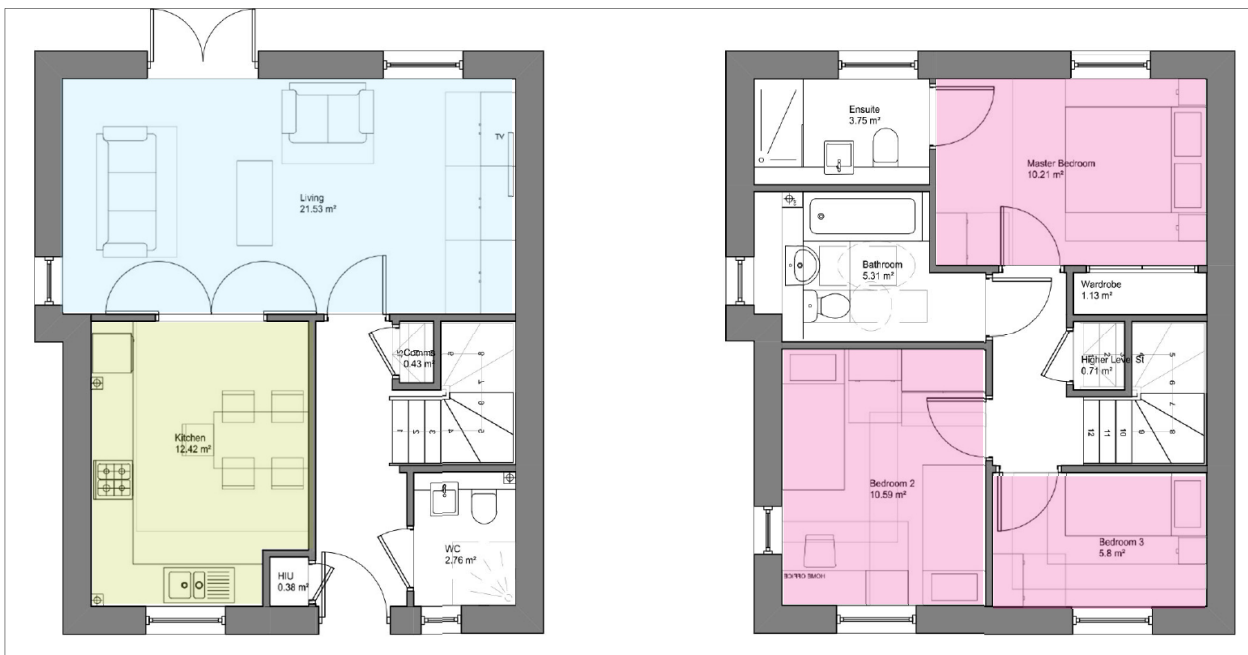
Dwelling 120 ground and first floor plans and analysed rooms highlighted.
